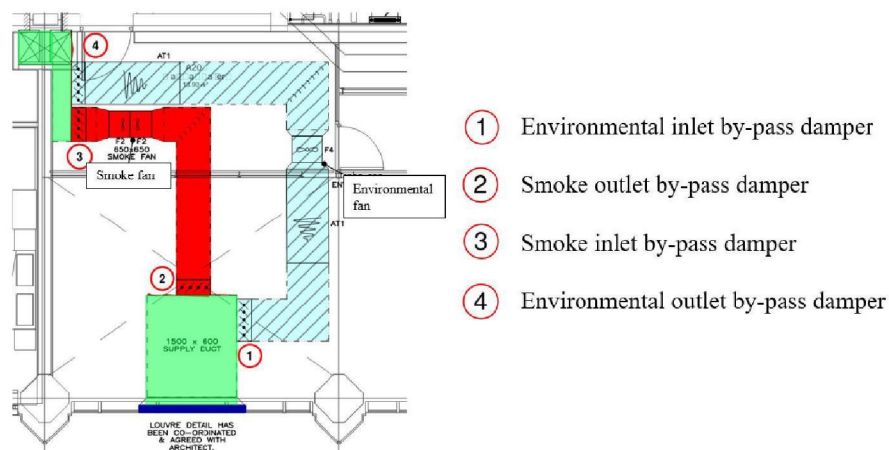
Layout of ductwork at Level 2. Light blue: environmental fan, dampers and ductwork. Red: smoke fans, dampers and ductwork. Green: shared ductwork, Dark Blue: external louvres. Dampers 1 and 4 serve the environmental fan. Dampers 2 and 3 serve the smoke fans.
